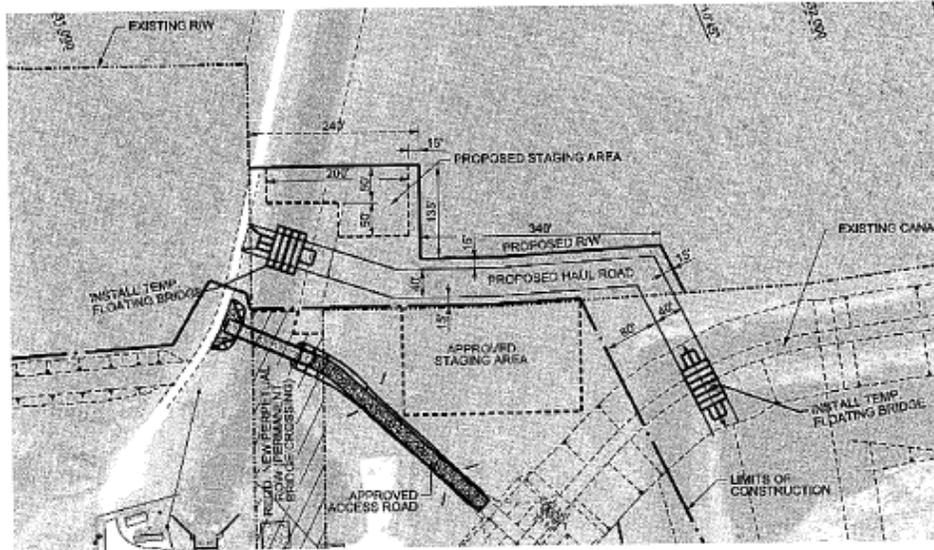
Proposed access road, staging area and pontoon bridges near the Lake Cataouatche Pump Stations 1 and 2.
